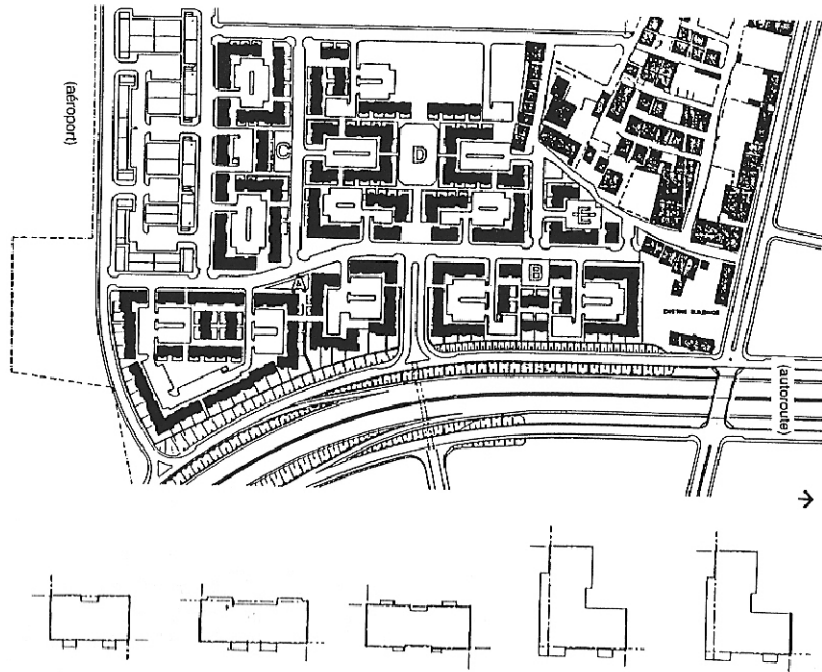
Elyssar Plan: mass plan of 7,500 low-income housing units
